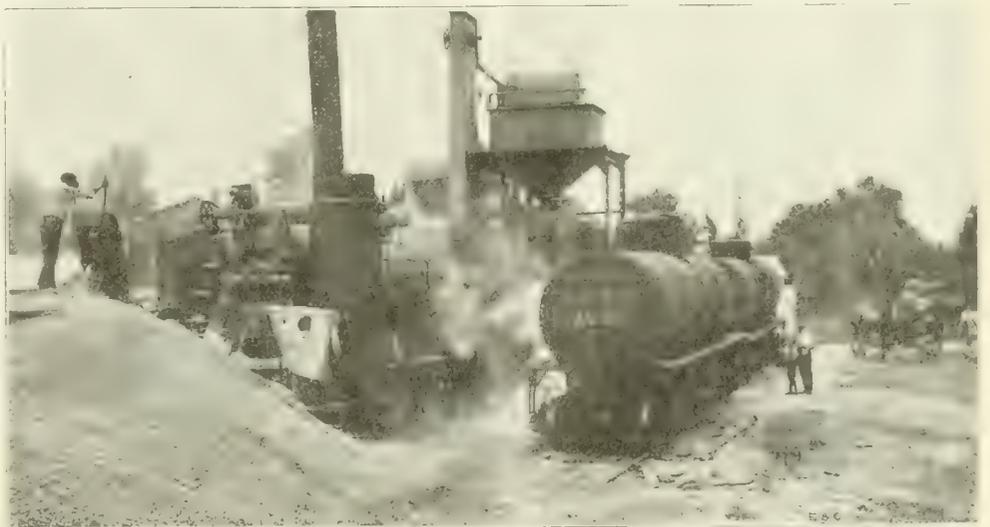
Mixing Plant Showing Stock Piles and Tank Cars.
